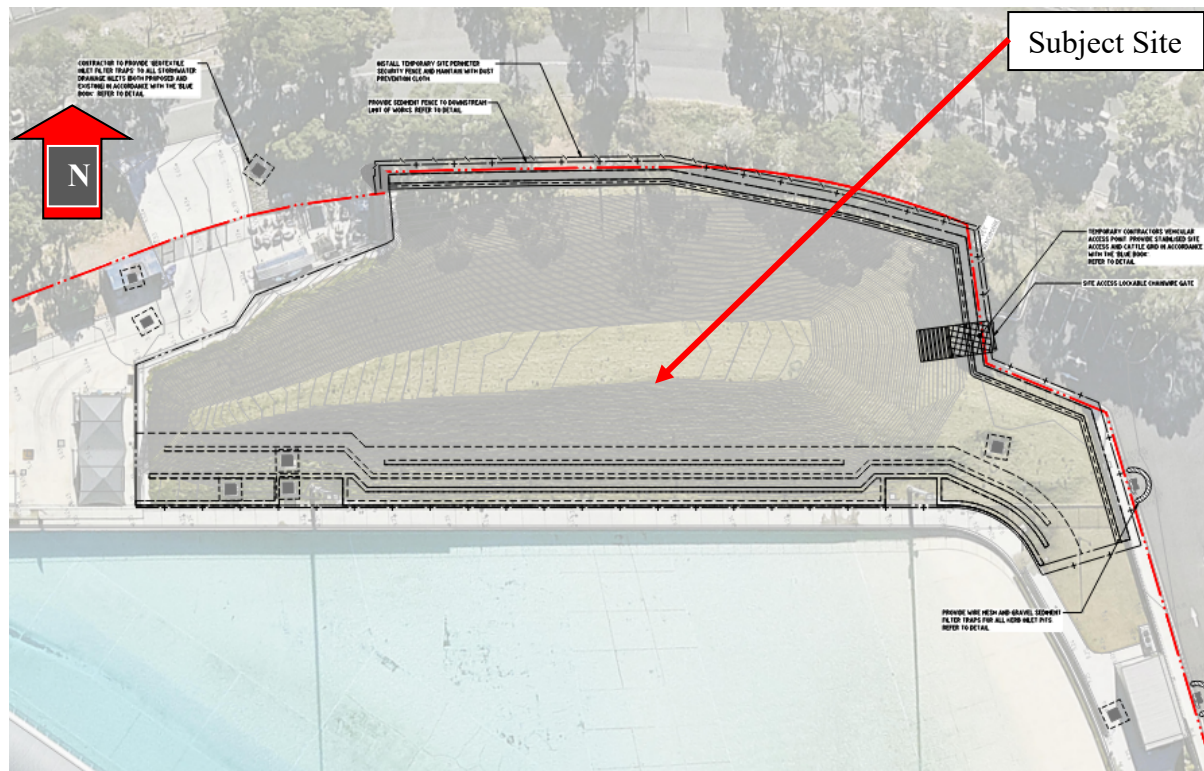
Site plan Showing the Batter Location (NORTHROP, 2026)
